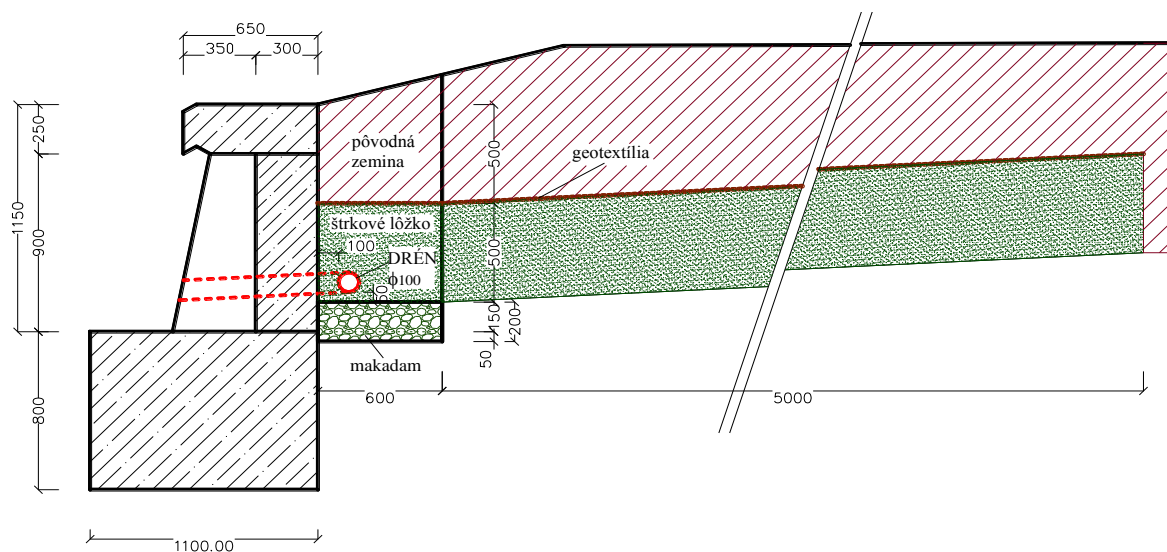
Illustration of the proposed cross-section improvement of location of drainage tubes
